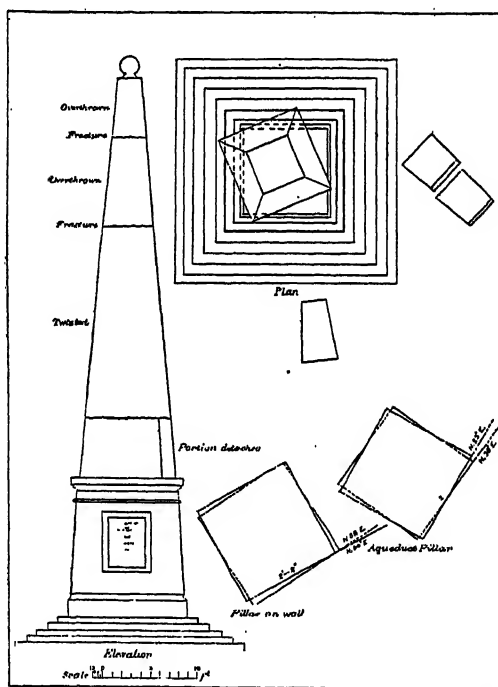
INGLIS'S MONUMENT AT CHHATAK IN ELEVATION AND PLAN, AND TWISTED PILLARS AT CHERRAPUNJI.
